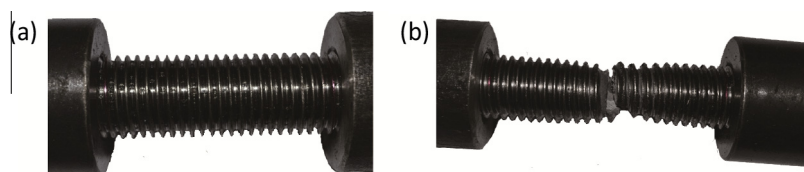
Bolt thread before (a) and after (b) tensioning test. Bolt rebar is BHRB500 type, and thread is M24.
